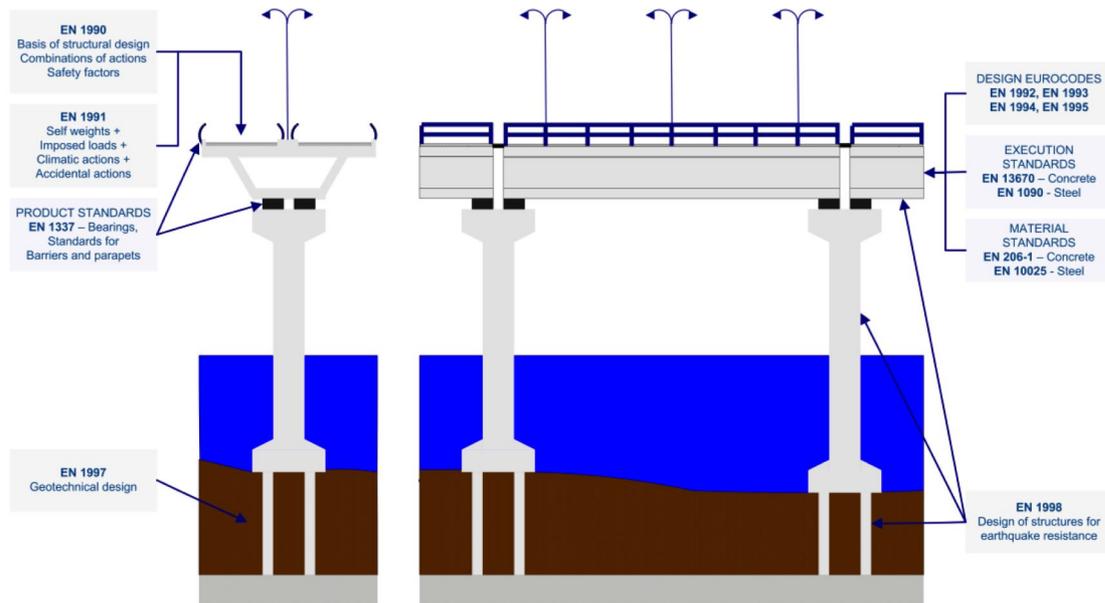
Summary of standards to be used for steel and concrete bridge constructions (from [27]).
